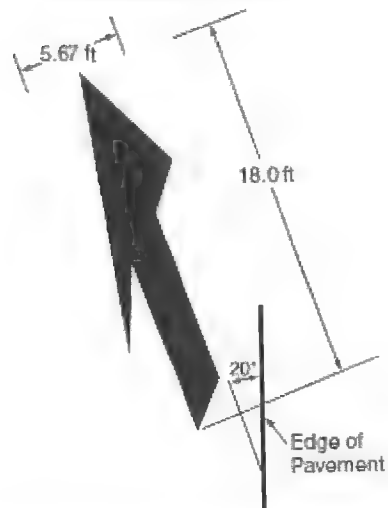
MUTCD Figure 3B-24: examples of standard arrows for pavement markings.
